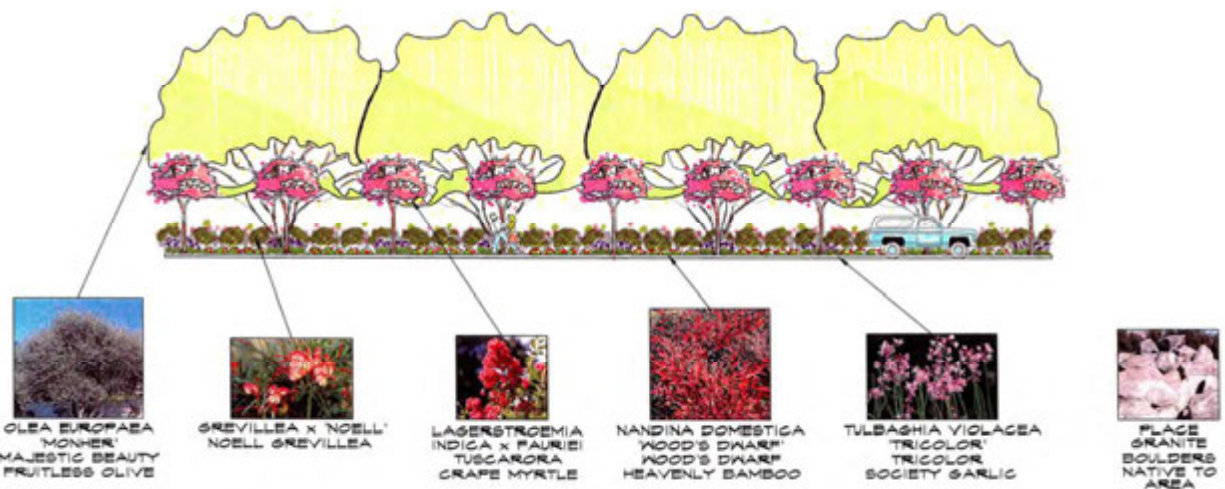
128' ARTERIAL ROADSIDE STREETSCAPE
